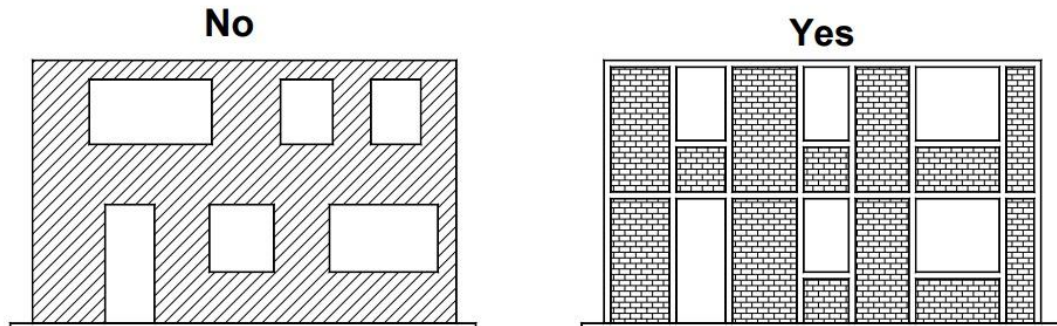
Location of openings in a building (*Svetlana Brzev, 2007*).
